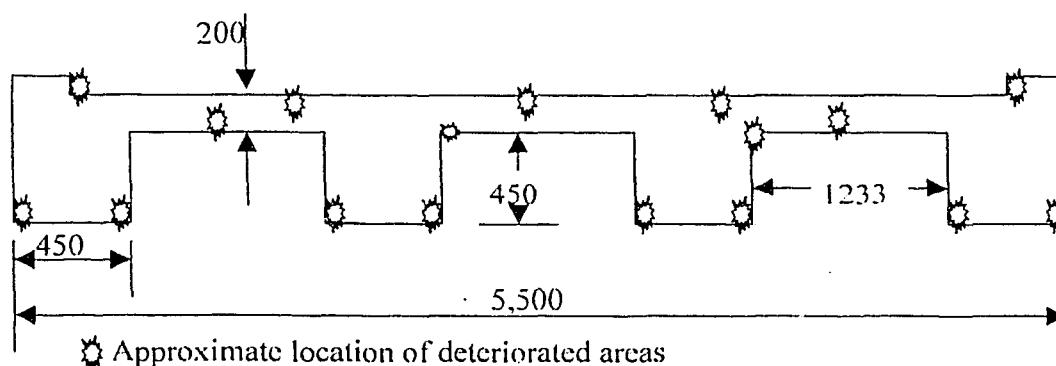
Cross-section of Existing Bridge Deck. * (All sizes are in mm)
